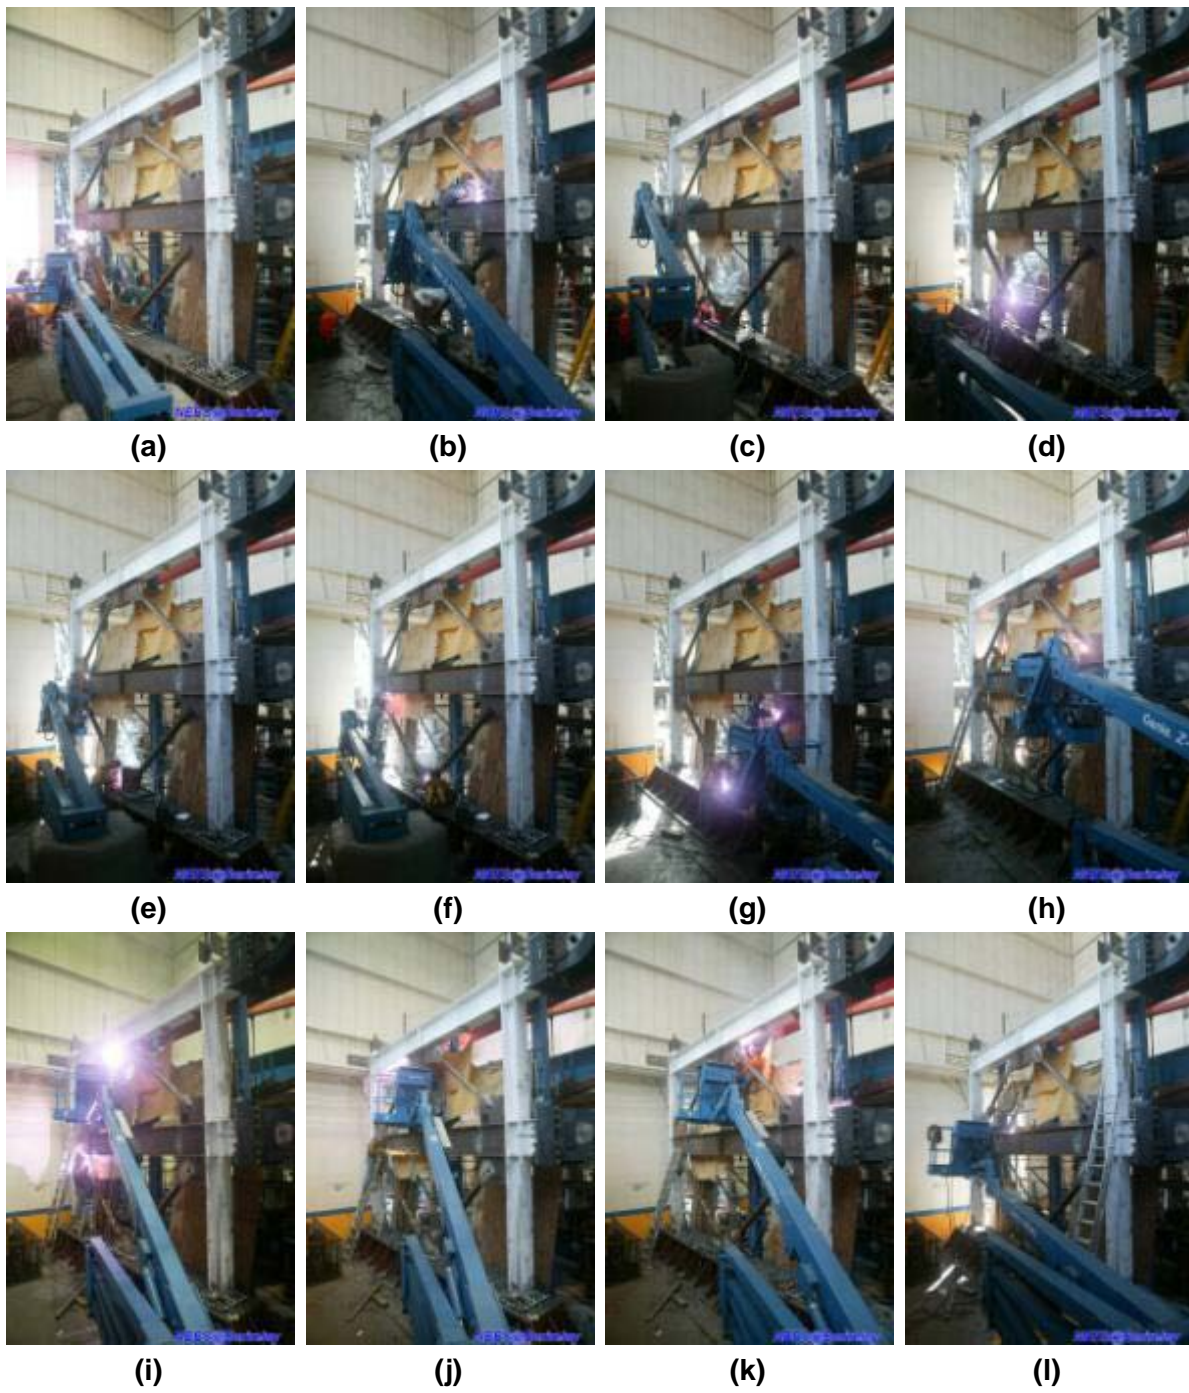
Splicing the lower beam to one-piece gusset plates in TCBF-B-2 specimen
